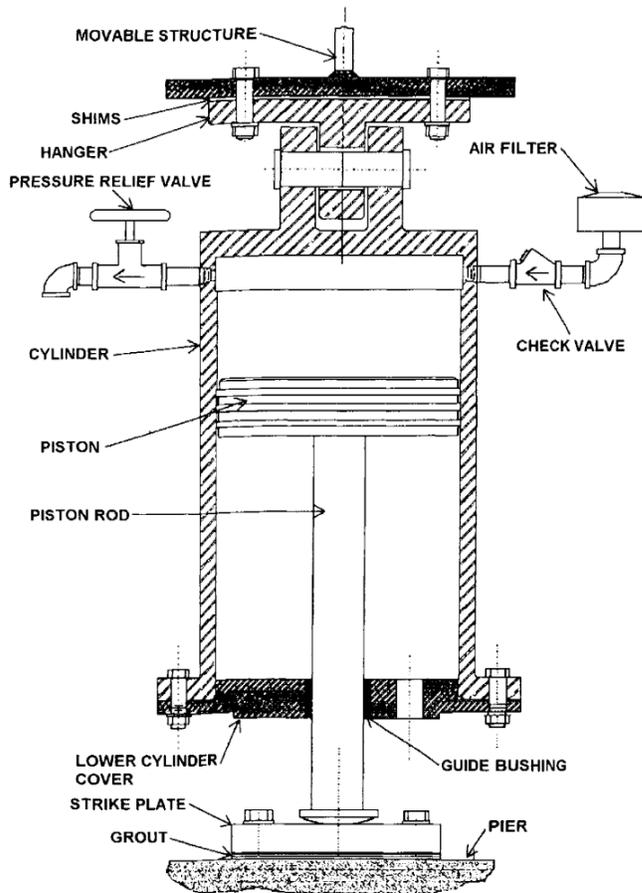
Construction of a typical buffer cylinder
